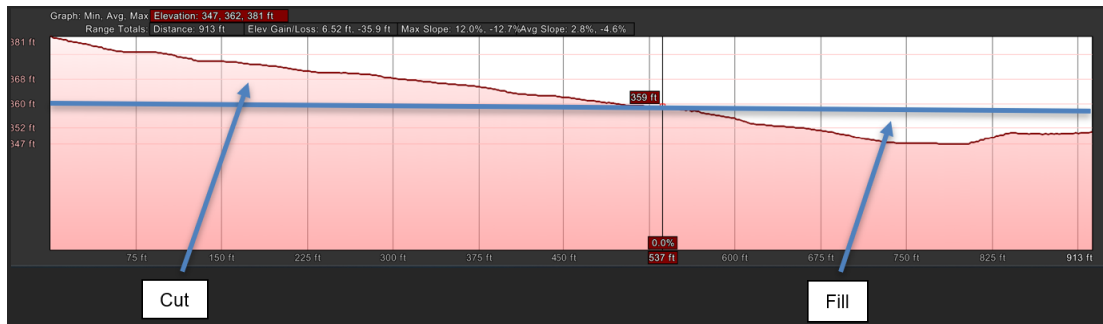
Section 7 Slope Elevation Profile (earth.google.com)
